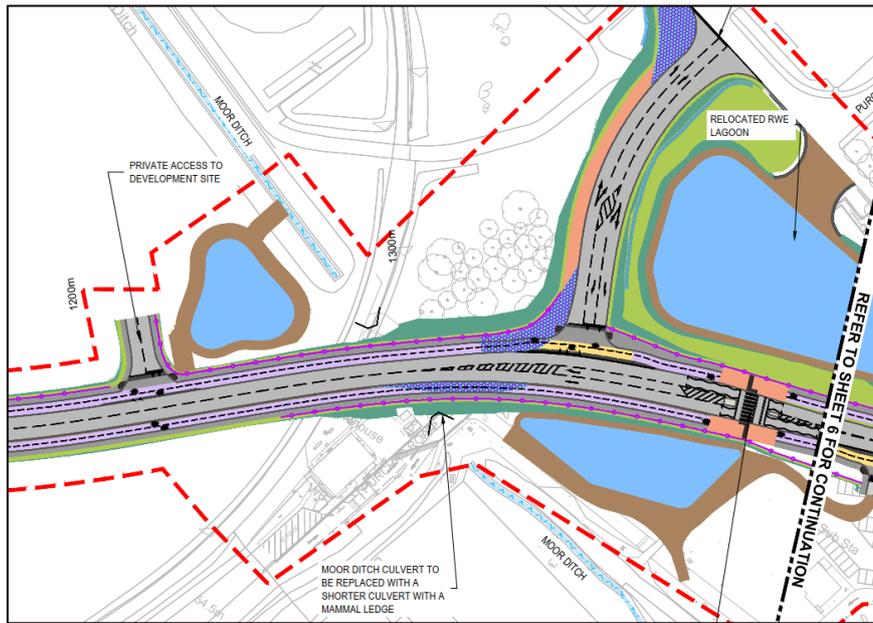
Moor Ditch and Drainage basins/lagoons in former power station site
